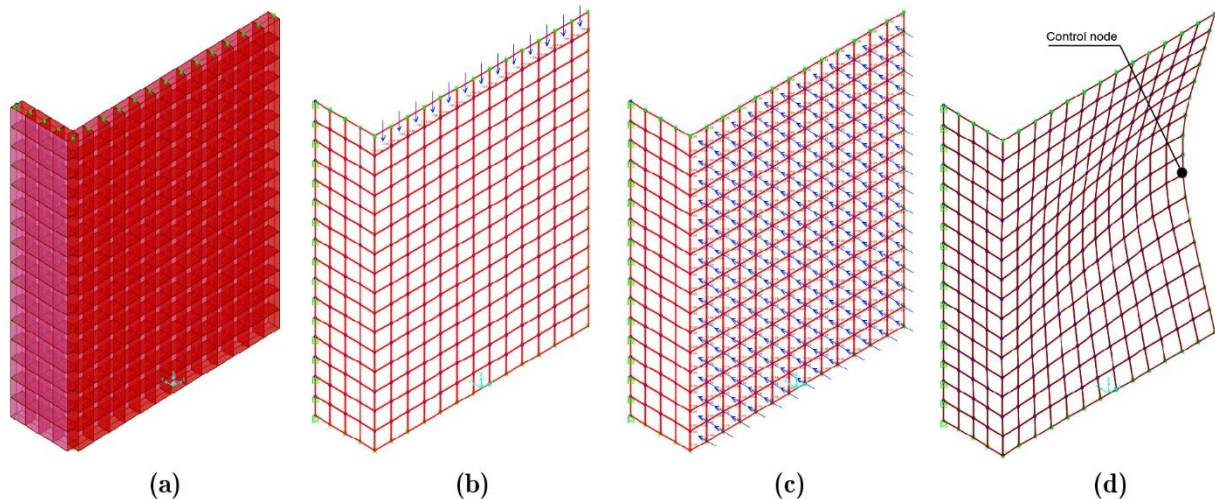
FE results of out-of-plane loaded masonry wall tested by Griffith and Vaculik (2007): (a) geometry, (b) surface pressure, (c) vertical pre-compression and (d) deformation.
